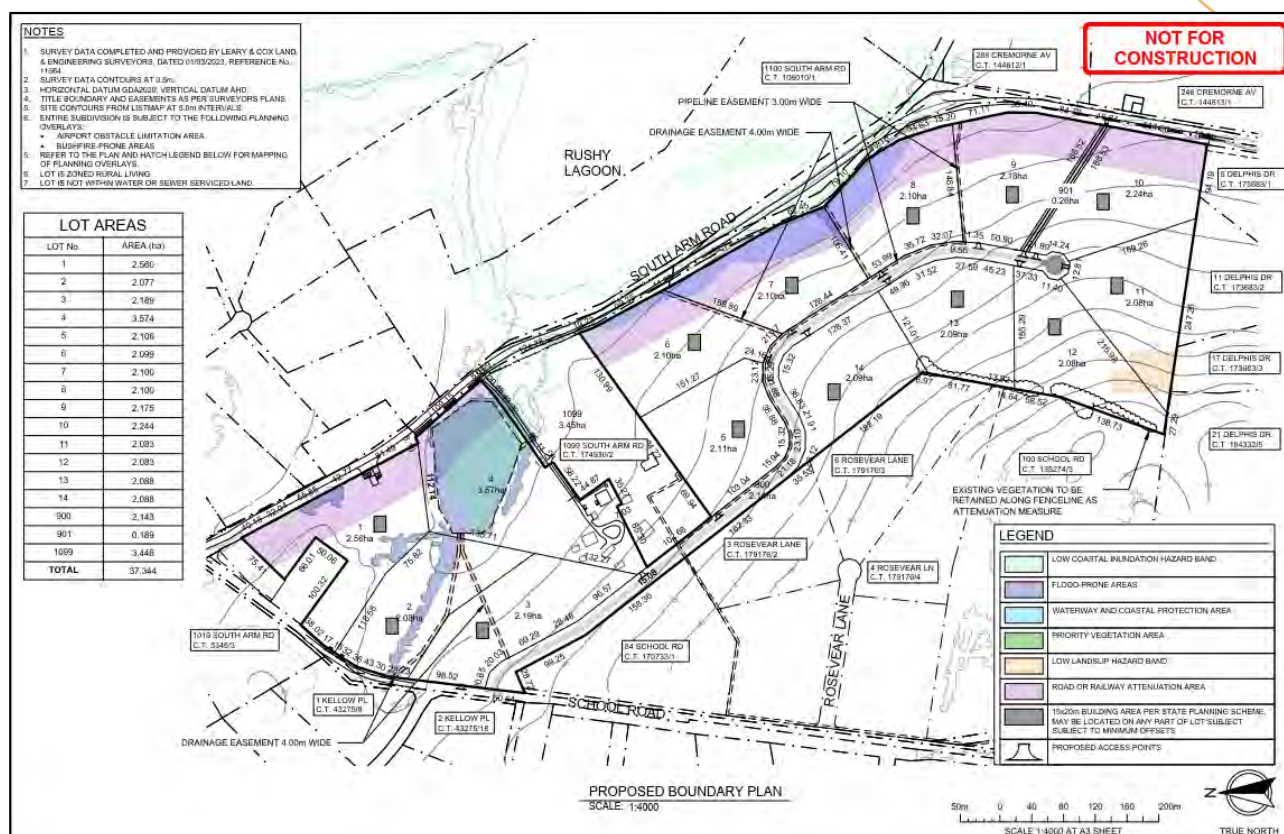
Proposed subdivision layout. Extracted from project drawing set.
